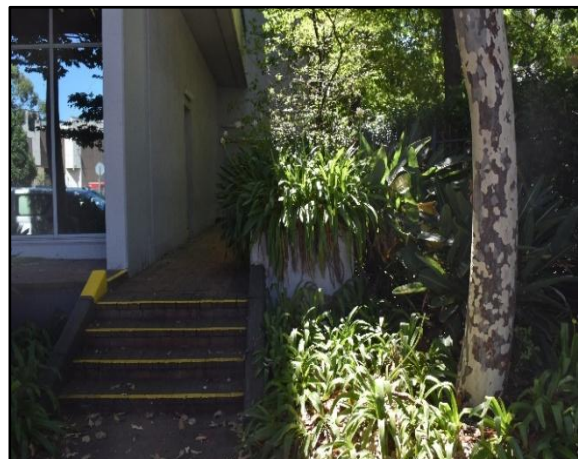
Concrete building structure at the north of the property on the boundary line of the current railway corridor
